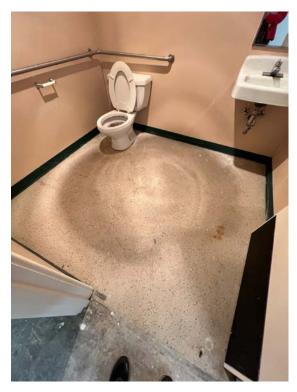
Floor Slab in Bathroom 1 of Adjacent-West Tenant Space (Suite B5) (November 14, 2024)
